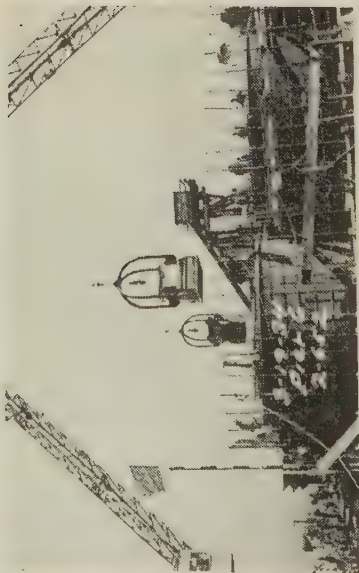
(lower left) Showing method of handling concrete, East approach structure. Fig. 11 (lower right) Vibrating concrete San Francisco anchorage.
